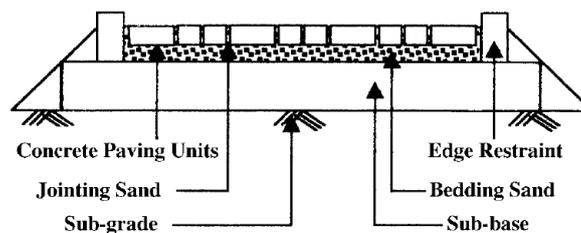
Concrete Block Pavement structure (Panda and Ghosh, 2001)
